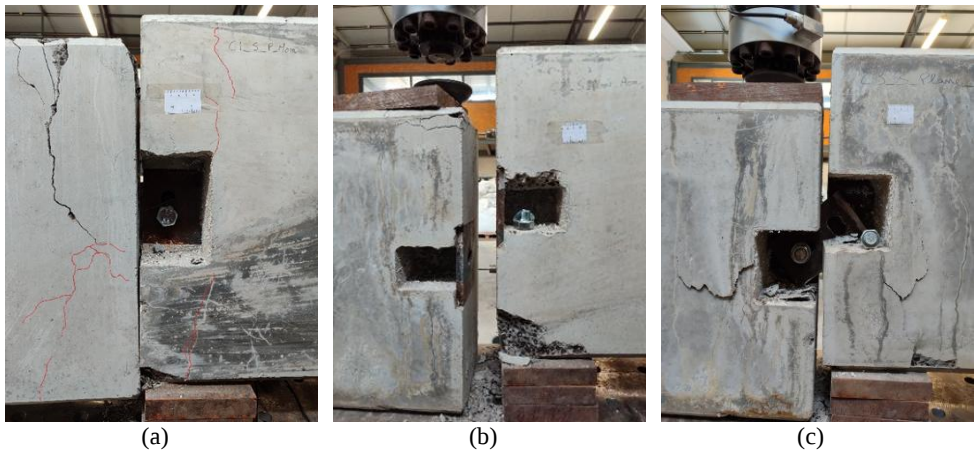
Crack pattern at failure: (a) Connection-1; (b) Connection-2 and (c) Connection-3.
